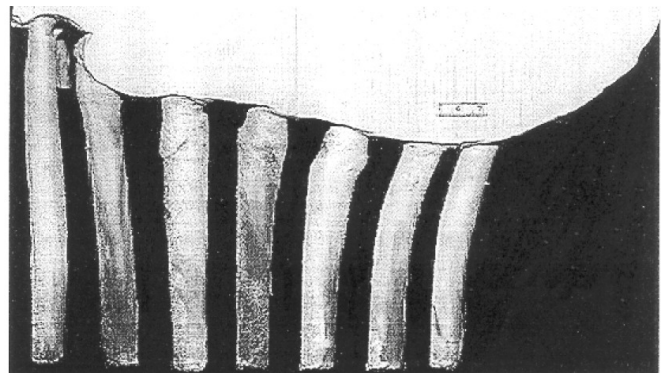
Deformed group of columns below flexible footing (Hu '95)
